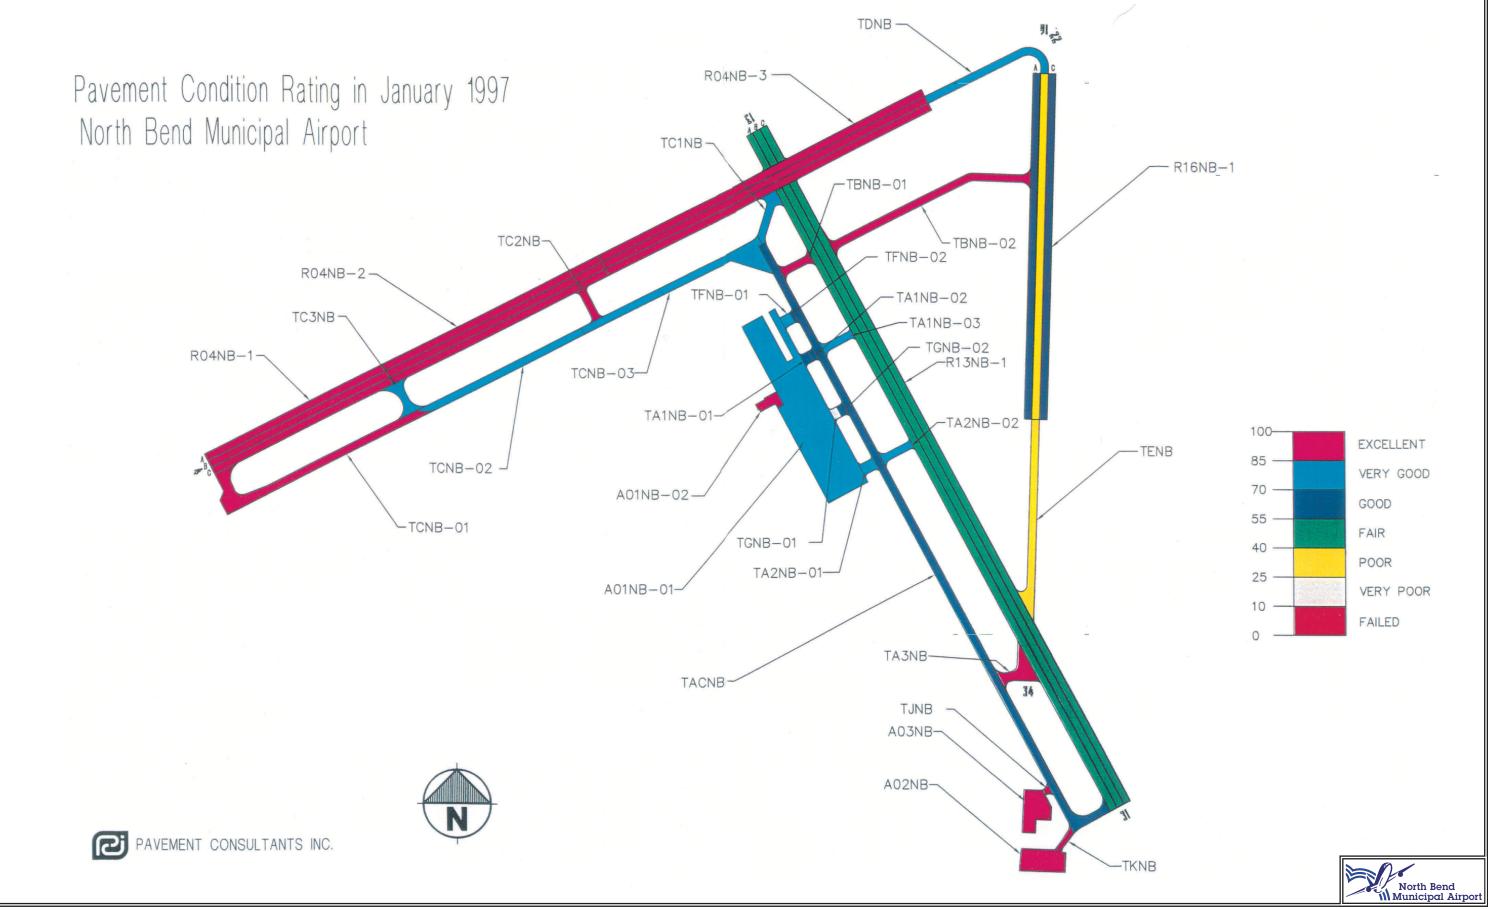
C PAVEMENT CONDITIONS RATINGS
